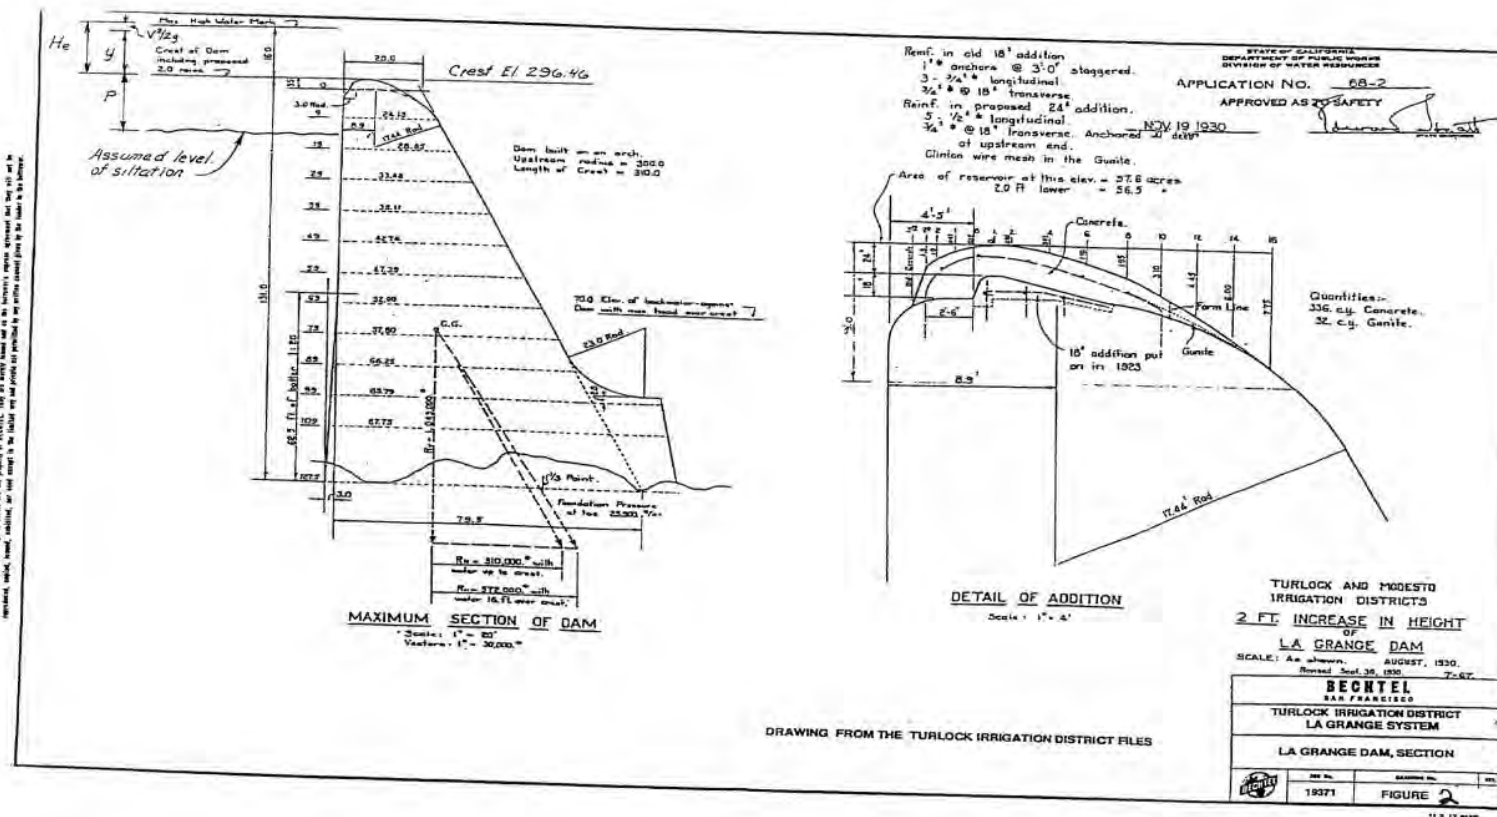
La Grange spillway section showing original crest and crest modification to present elevation of 296.5 feet.
